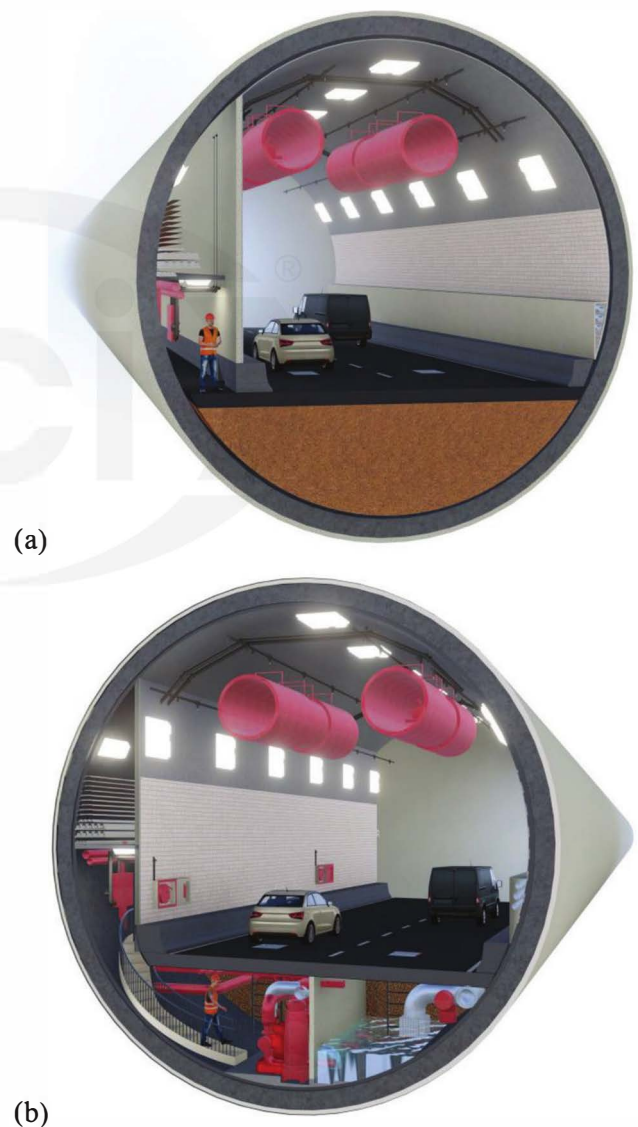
Schematics of interior space of TBM-bored road tunnels: (a) typical section; and (b) section at low-point pump station.
